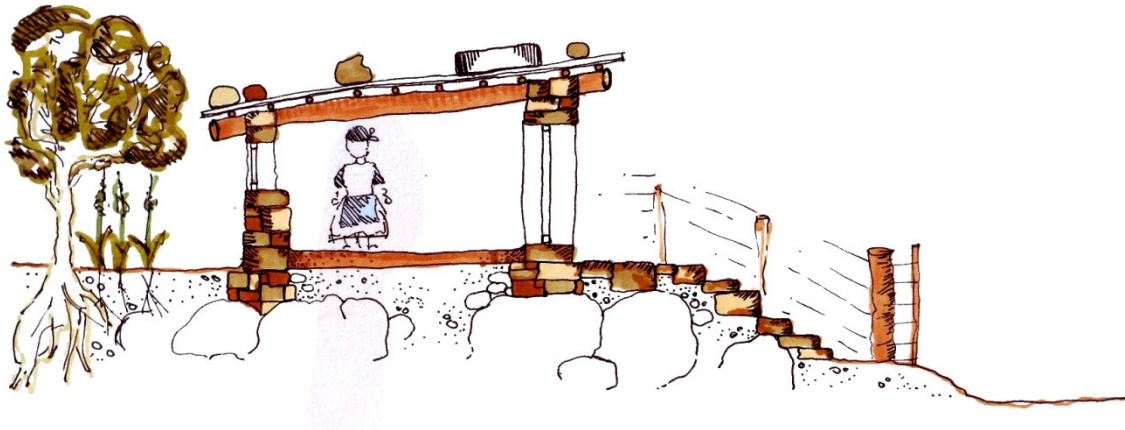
Section through an isiXhosa dwelling depicting the use of available materials as well as rocks used to anchor the roof
